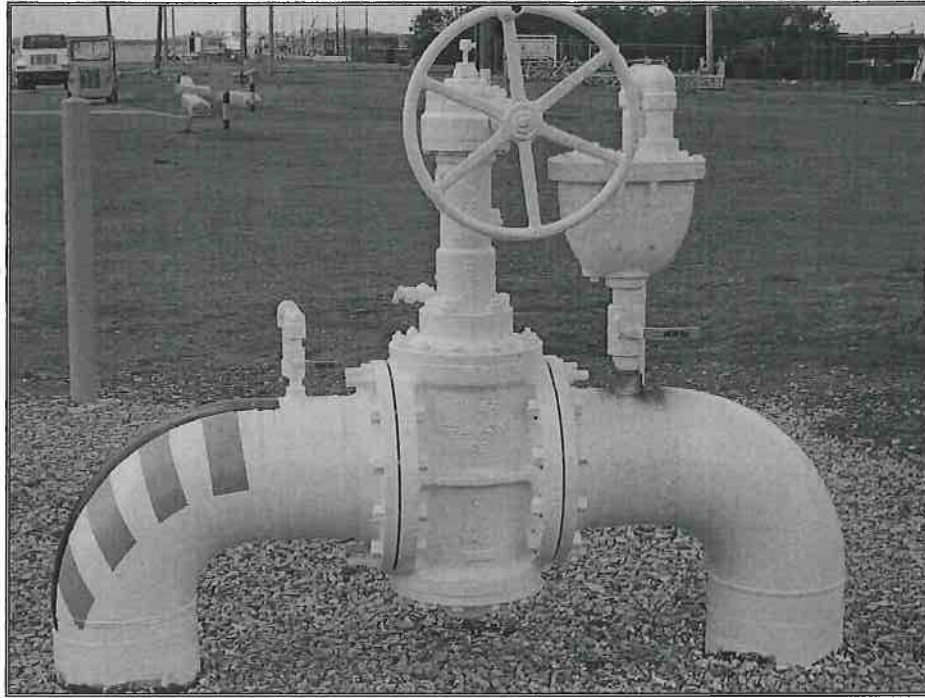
C – VP 24 Valve Setting Installation DFM Pipeline to Pier 3
